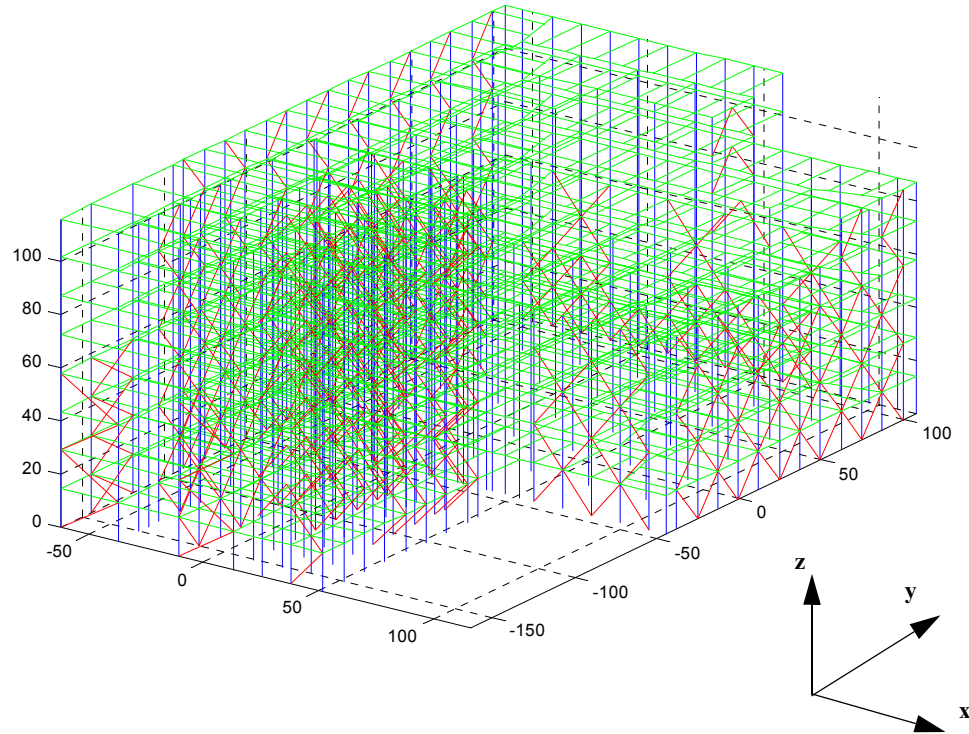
Structural Diagram of the 8-story L-shaped Building.
